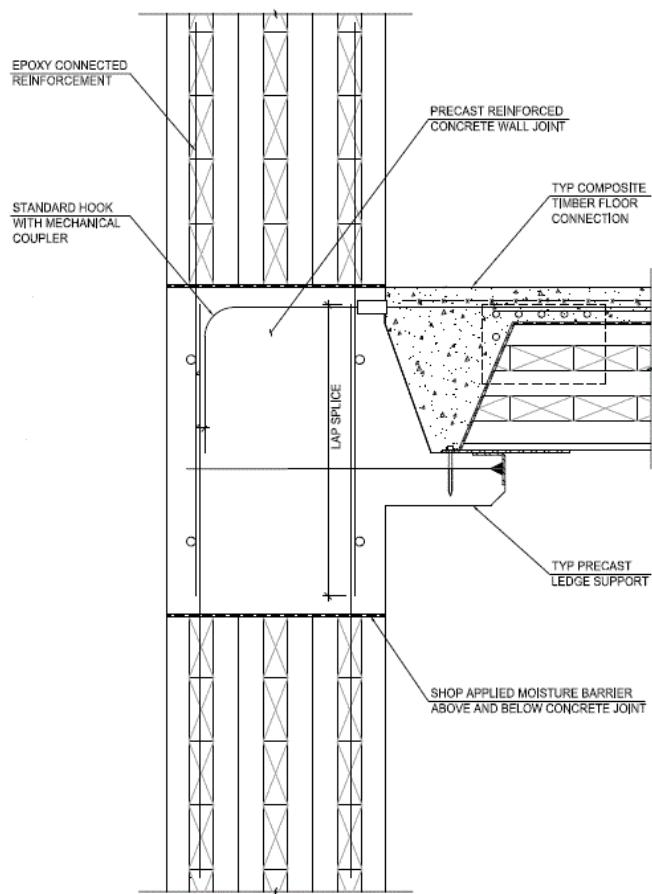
SOM concrete joint detail (Skidmore et al., 2013).
